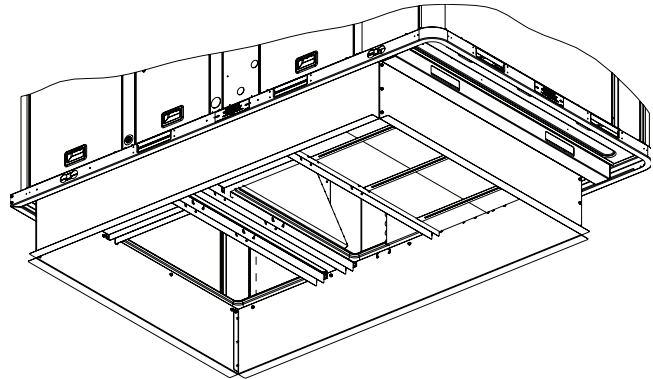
View for base to roof curb alignment THC120F on 60" x 84" roof curb
